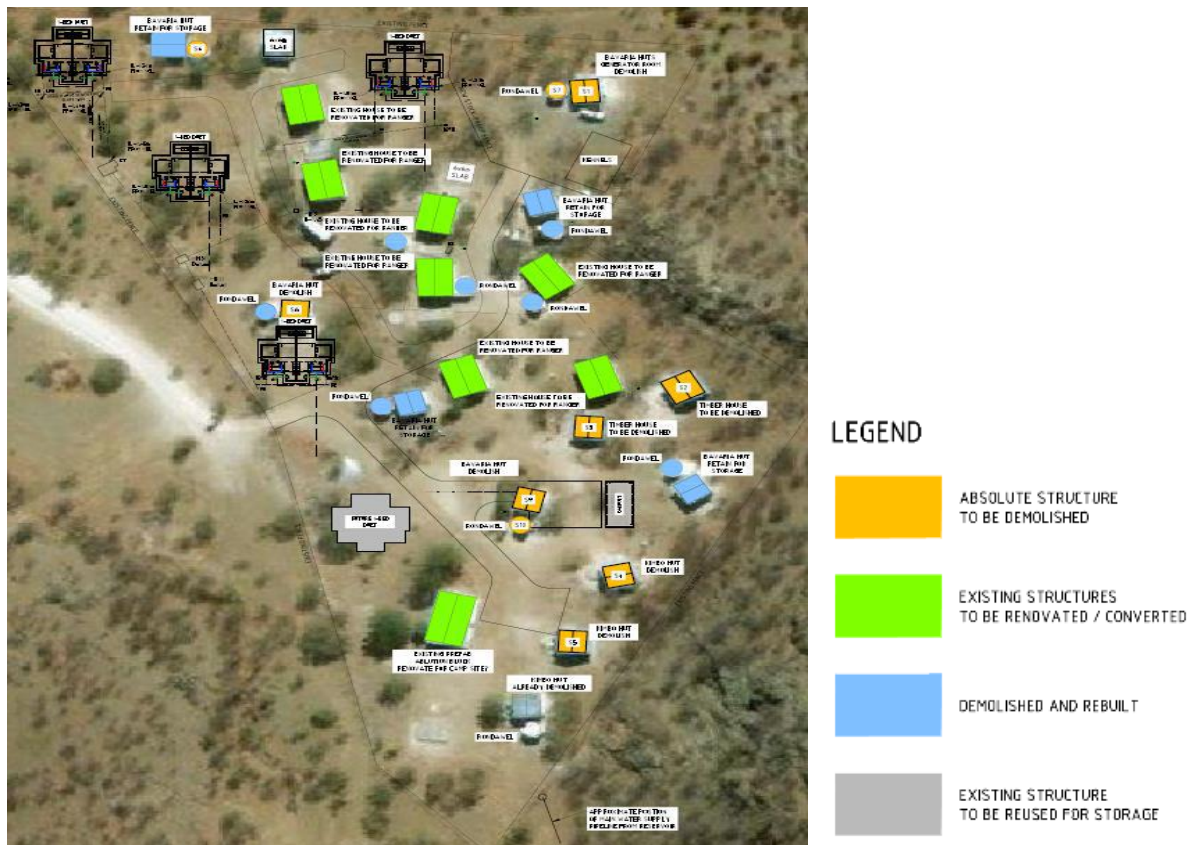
The proposed infrastructure layout at Otjovasandu B (photo: IWPP 2023)
